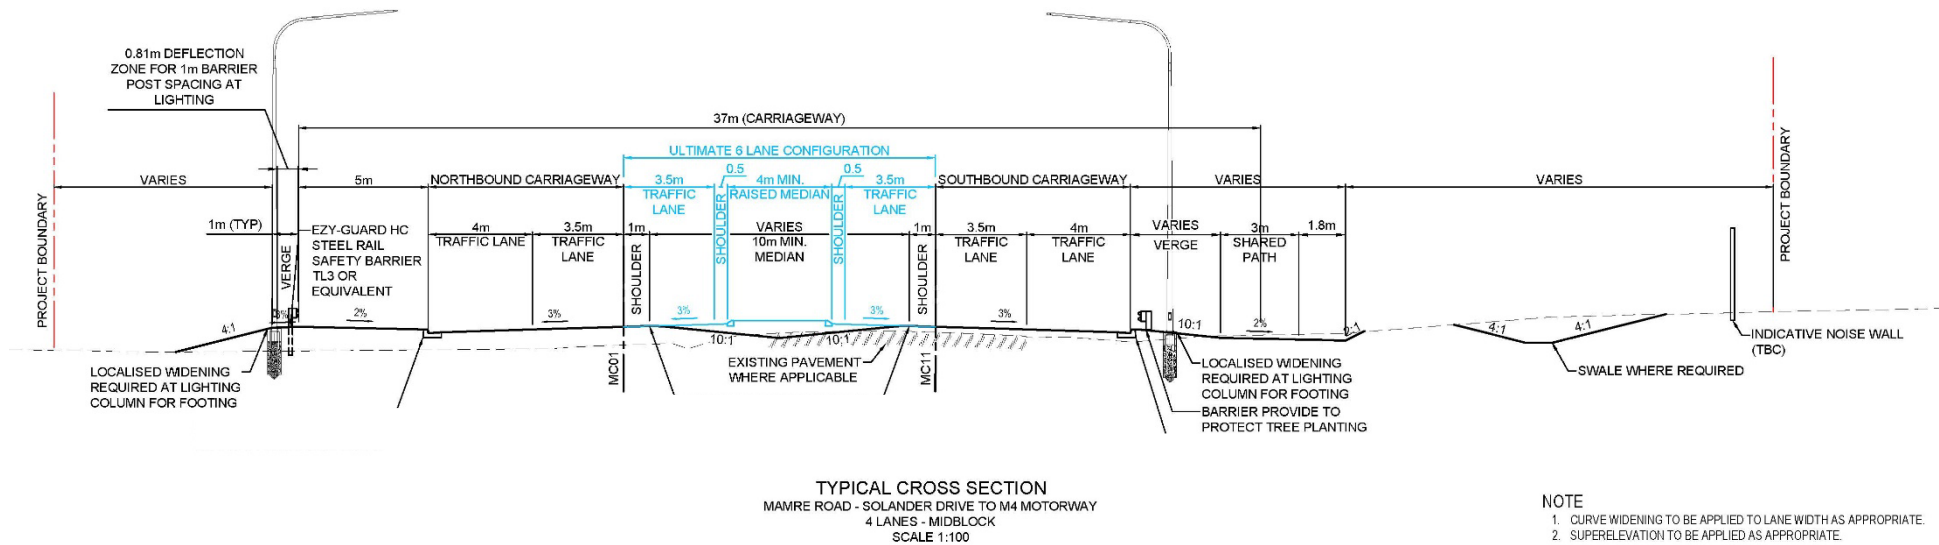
Typical cross section of Mamre Road between Solander Drive and the M4 Motorway (between intersections) after being upgraded by the proposal
